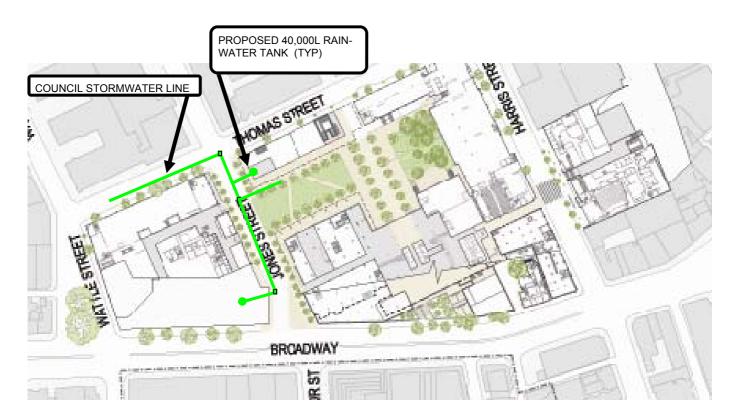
(ABOVE) This site plan indicates the proposed new stormwater connections for the Broadway and Thomas Street buildings, as well as for the renovated Alumni Green public space. The incorporation of rainwater storage tanks in both new buildings will significantly decrease the stormwater runoff associated with the Broadway campus. The design team will perform a comprehensive site water balance report during detailed design in order to design appropriately sized stormwater retention and detention
